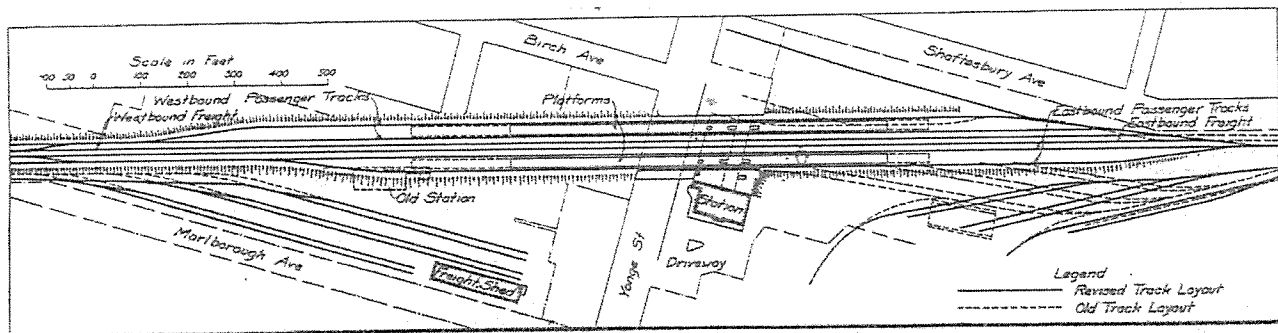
Track Arrangement, North Toronto Station, Canadian Pacific Railway.
